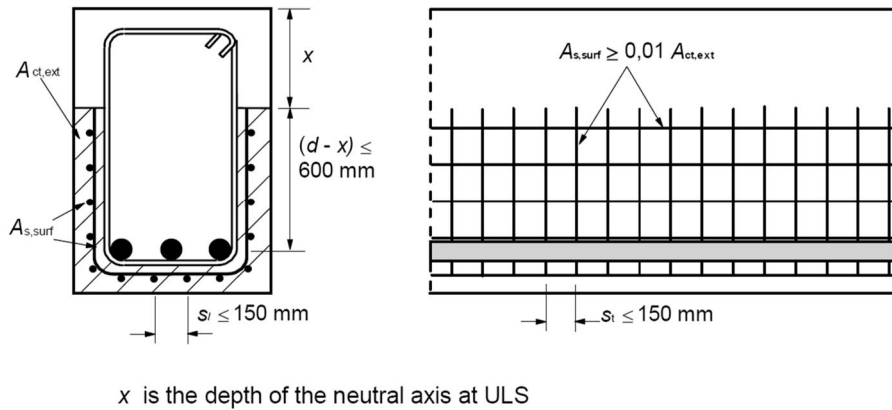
Example of surface reinforcement. [22, p. 221]
